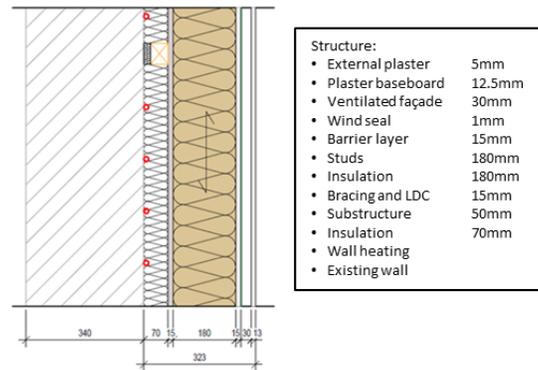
THE PRELIMINARY LAYOUT OF THE EWHC WALL.
